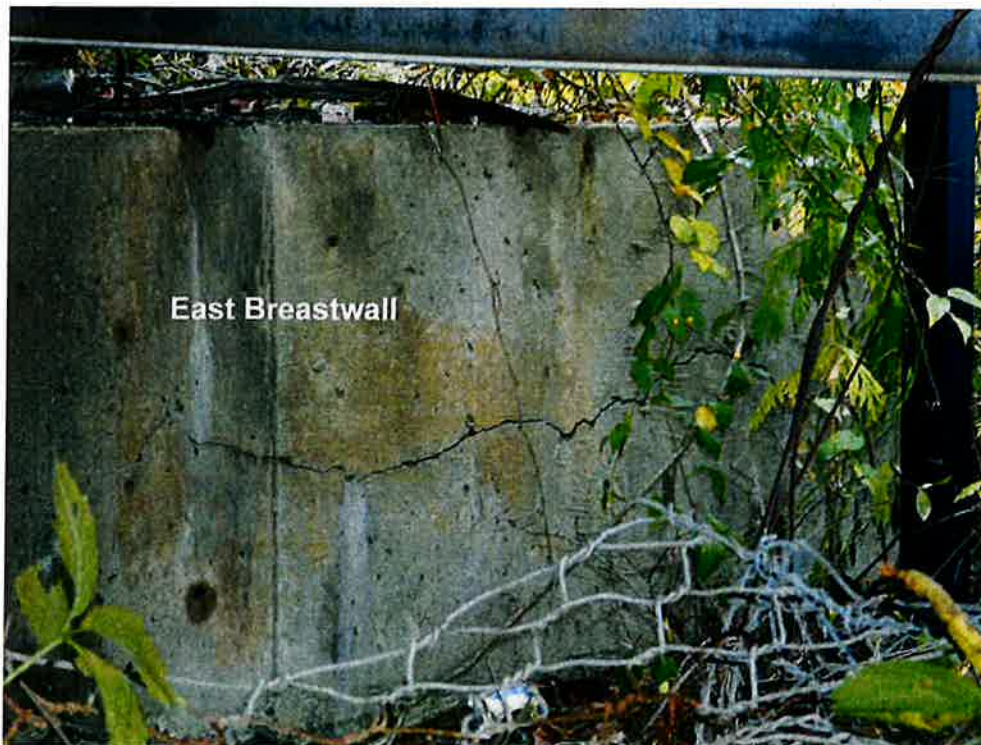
East Breastwall, under South Truss, has a 4' long x up to 1/8" wide horizontal crack.
